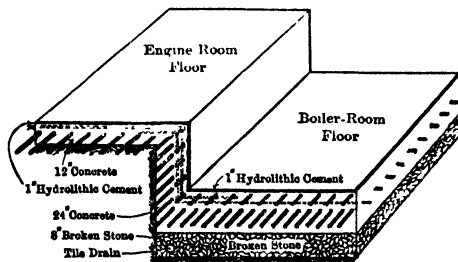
Reinforced-concrete Floor with Water-proof Cement
